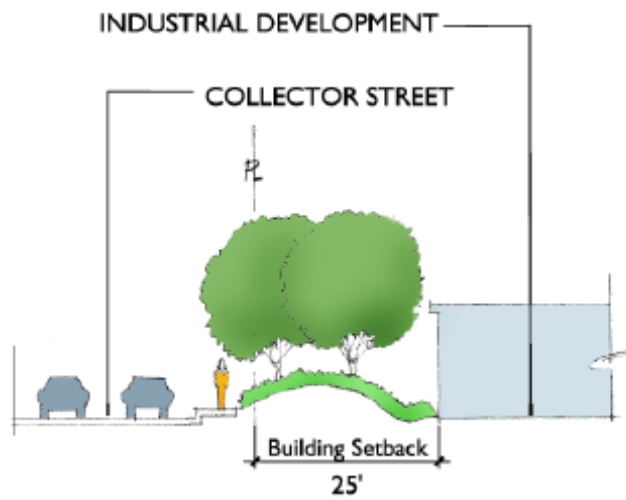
M1/M2 Setback Without Parking (Collector Street)
